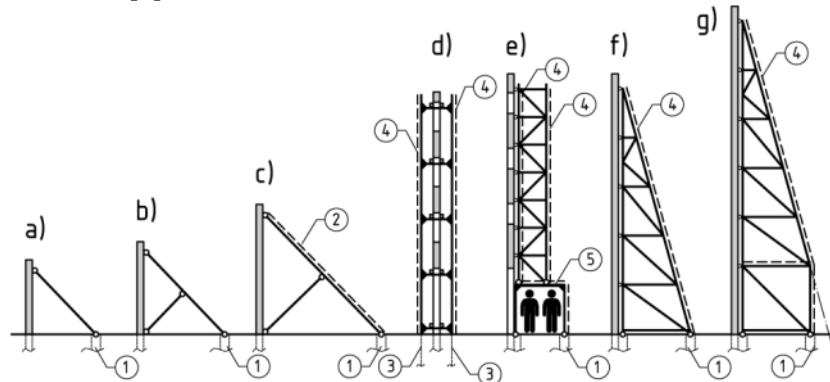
Examples of design solutions of renovation bracings of angle strut-cantilevered type 1 - the temporary foundation (newly designed or used an existing one), 2 - truss or frame bracings, 3 - steel pile, 4 - truss bracing, 5 - steel portal frame
